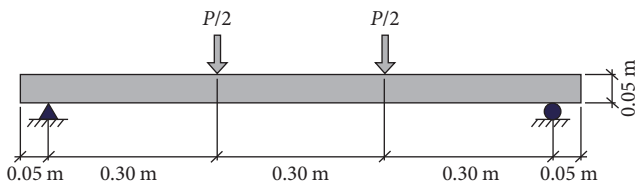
Dimensions and details of SIFCON plate specimens.
